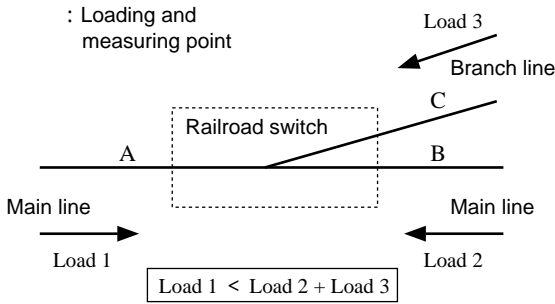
A railroad switch subjected to axial loads<sup>(8)</sup>
